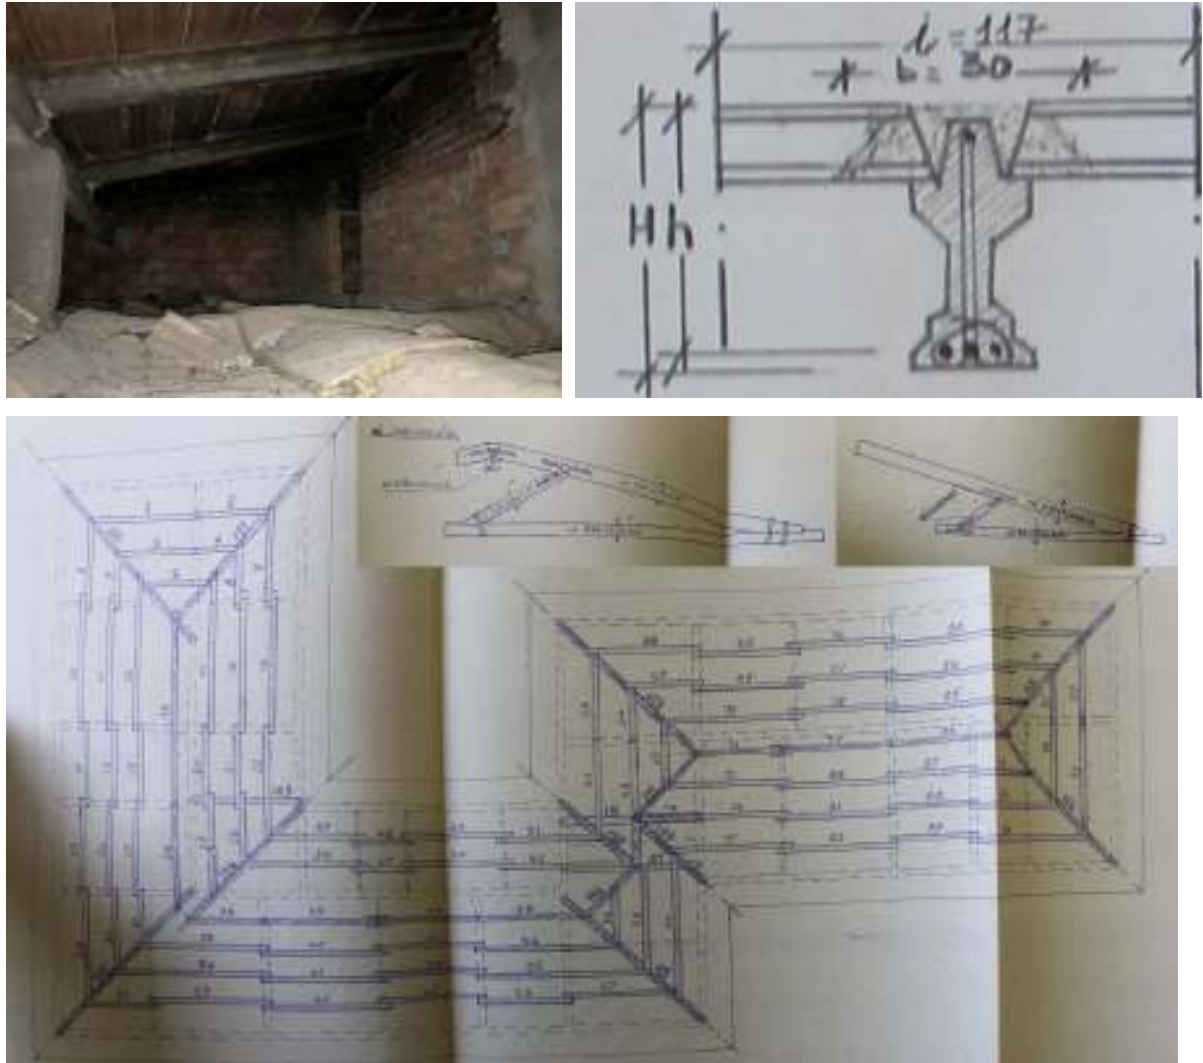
Top on the left: the attic floor with the RC beams sustaining the roof. On the right: detail drawing of the Varese joist for the roof. Below: timber roof structures. (Source RFI archive).
